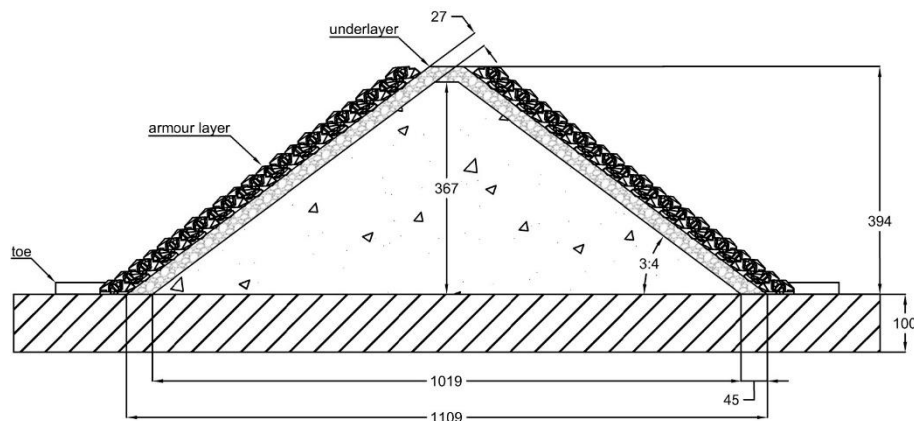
Roundhead cross-section, dimensions in millimetres.
